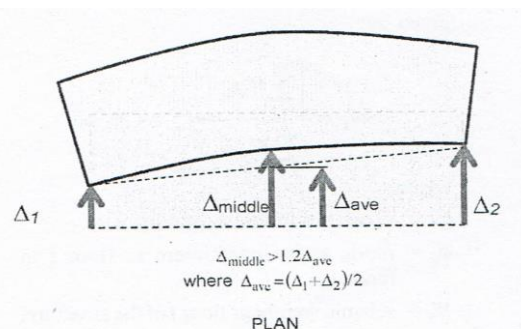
DEFINITION OF FLEXIBLE FLOOR DIAPHRAGM
